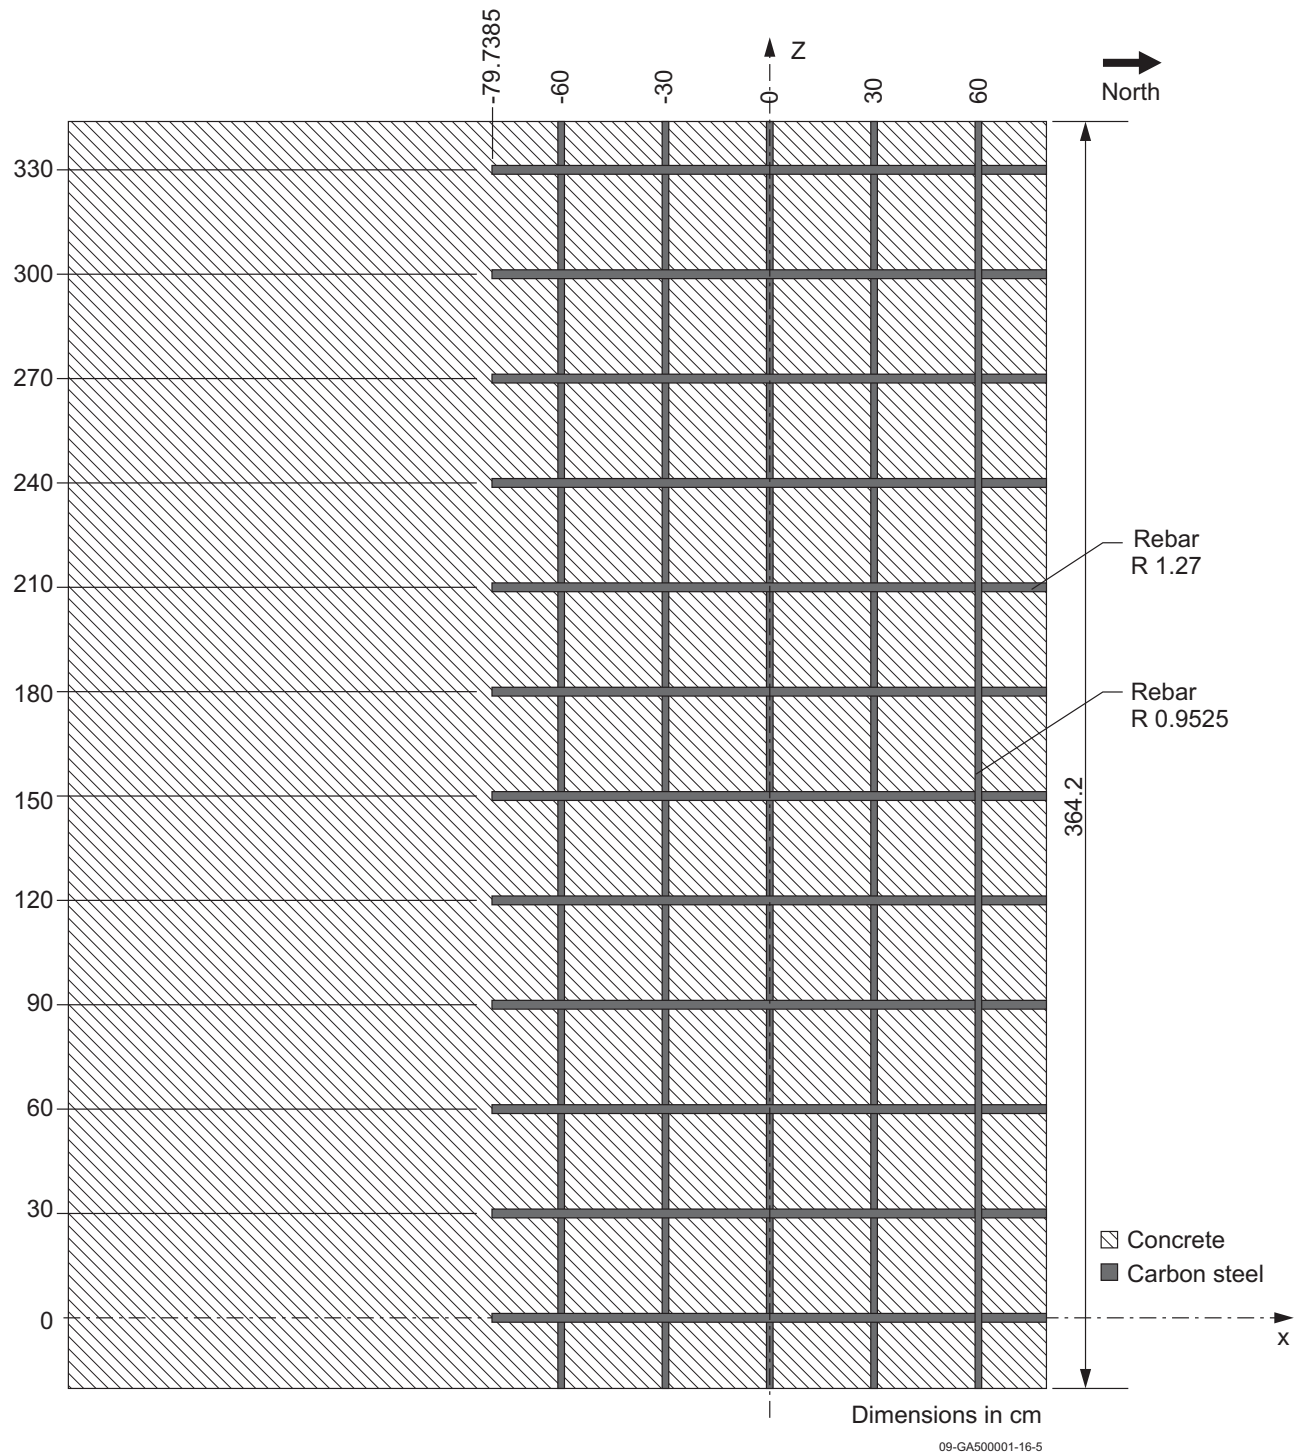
Detailed Model, East Wall Showing Rebar Positions.
